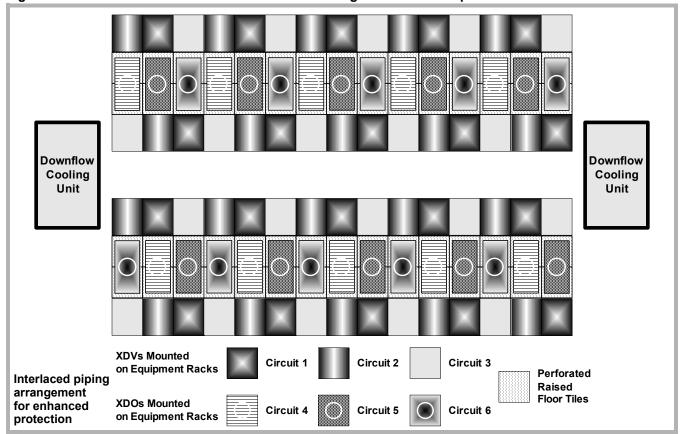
Liebert XDV units mounted on racks emitting 16kW of heat top view
